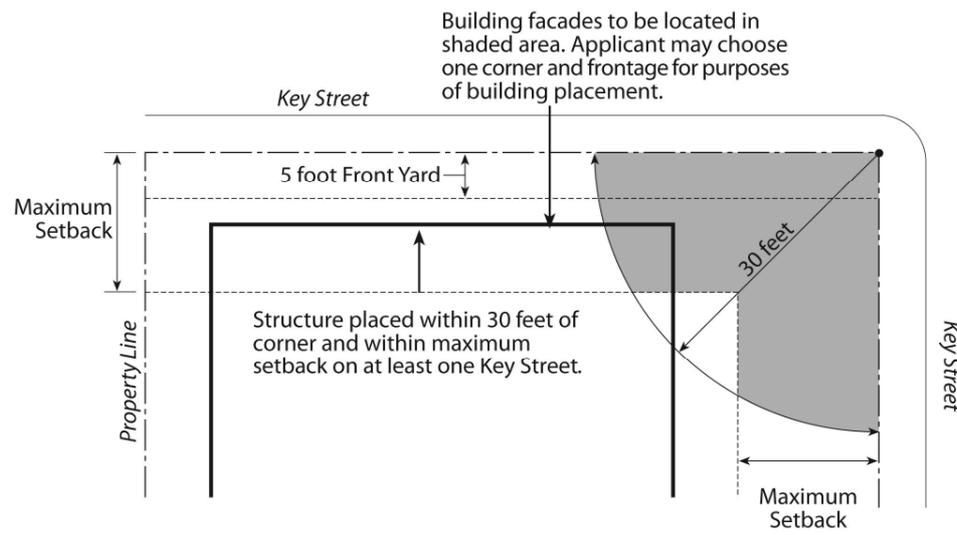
Building facade placement on corner lots fronting two key streets
